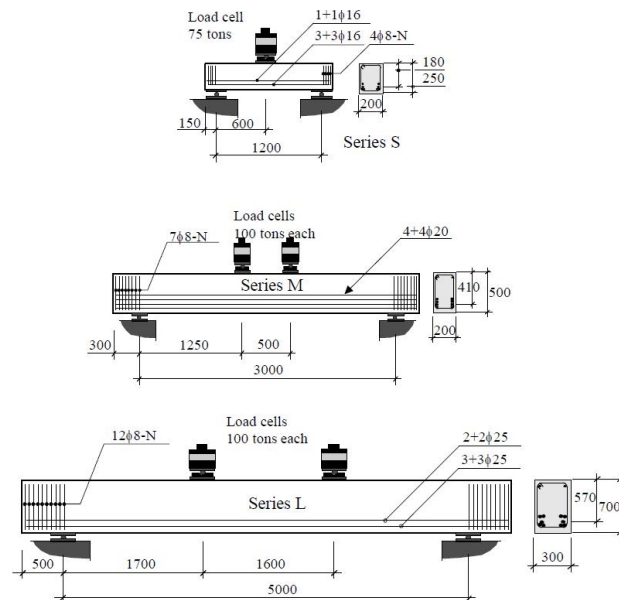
Geometry and reinforcement arrangement of the beams and loading configuration [NOG2000]
